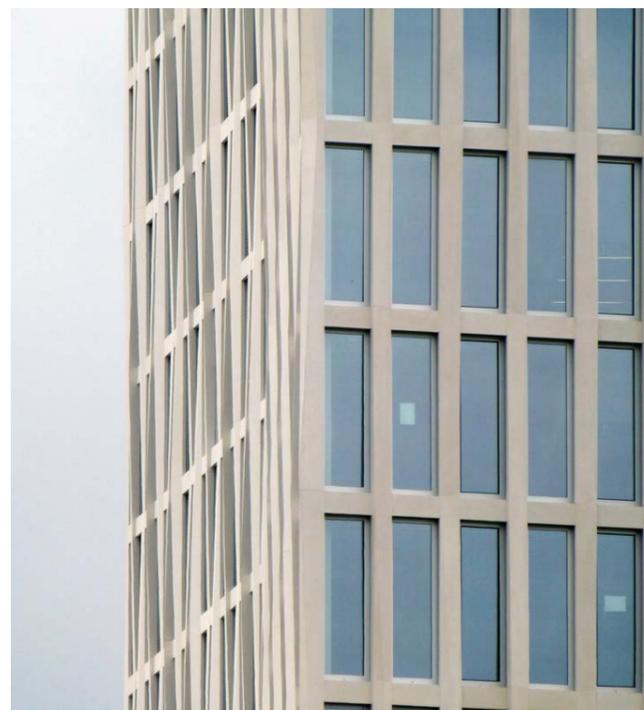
Example of a precast reconstituted stone faceted column, Tour Total Office Building, Berlin, Architect: Barkow Leibinger
